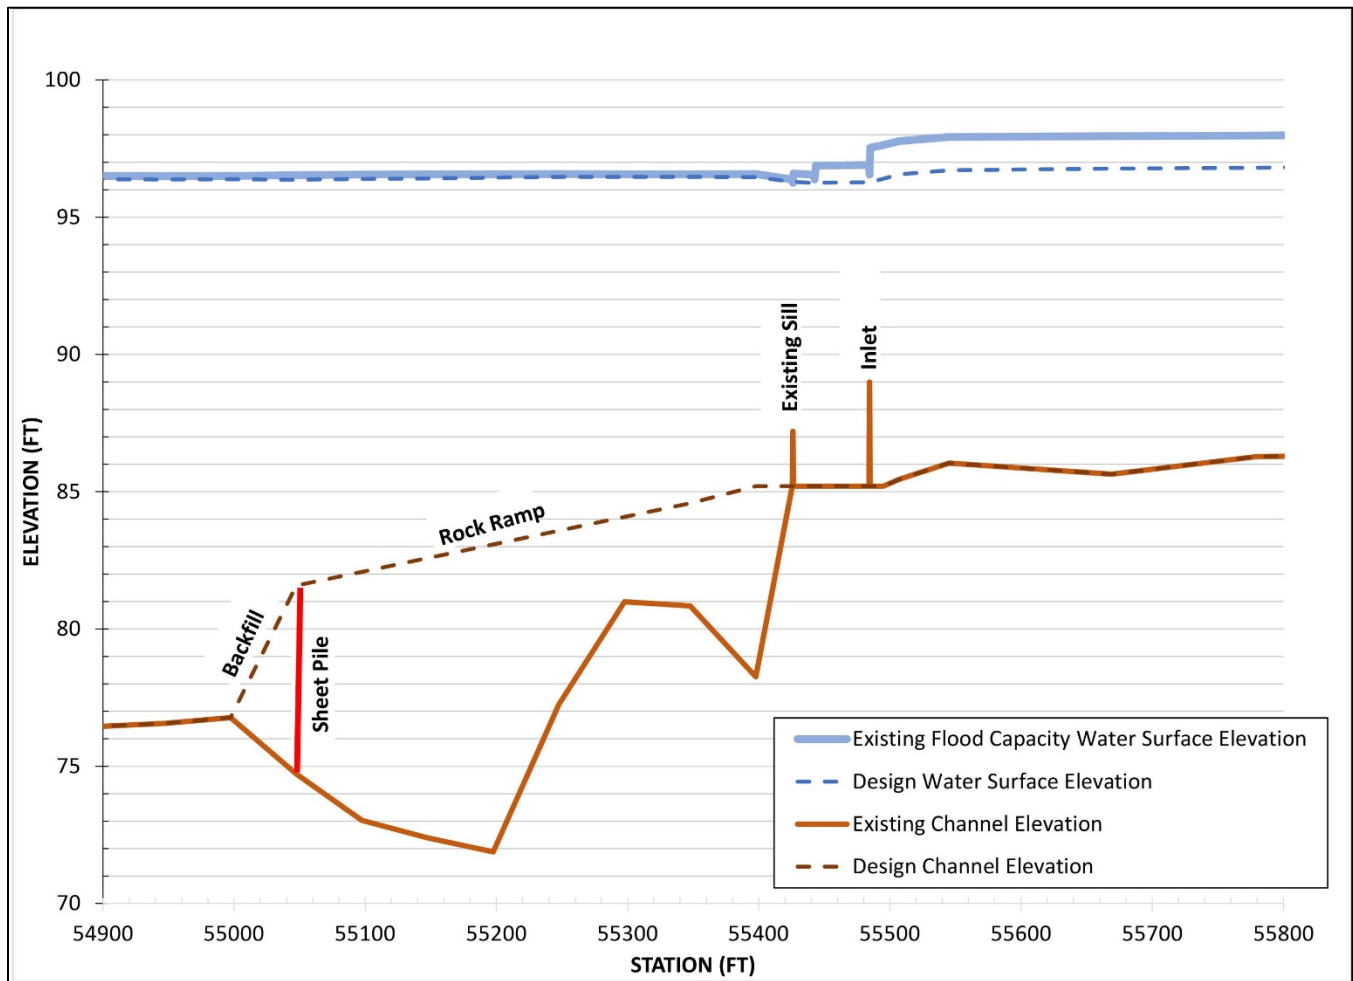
Eastside Bypass Control Structure Typical Cross Section
